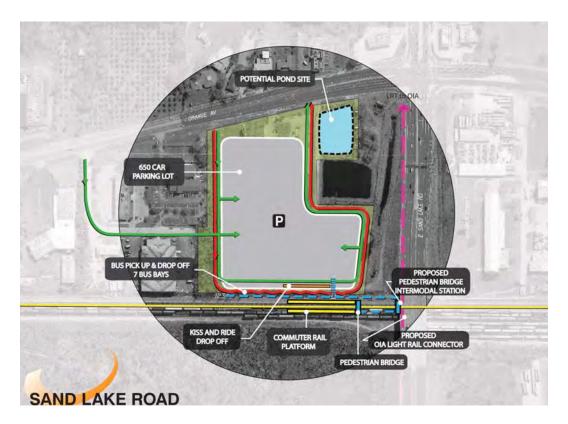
Conceptual Station Site Plan – Sand Lake Road
